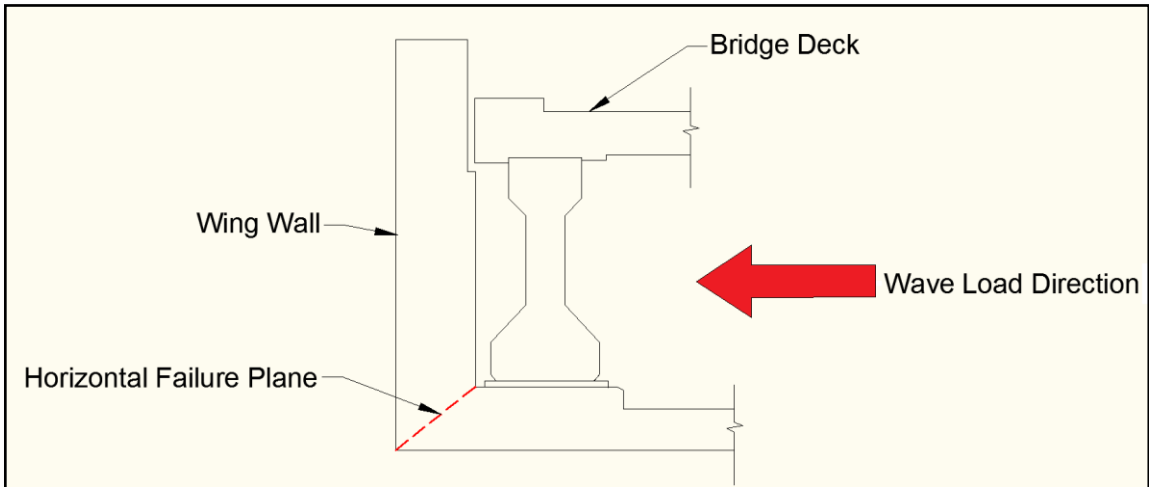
Wing Wall Horizontal Failure Plane (profile view)
